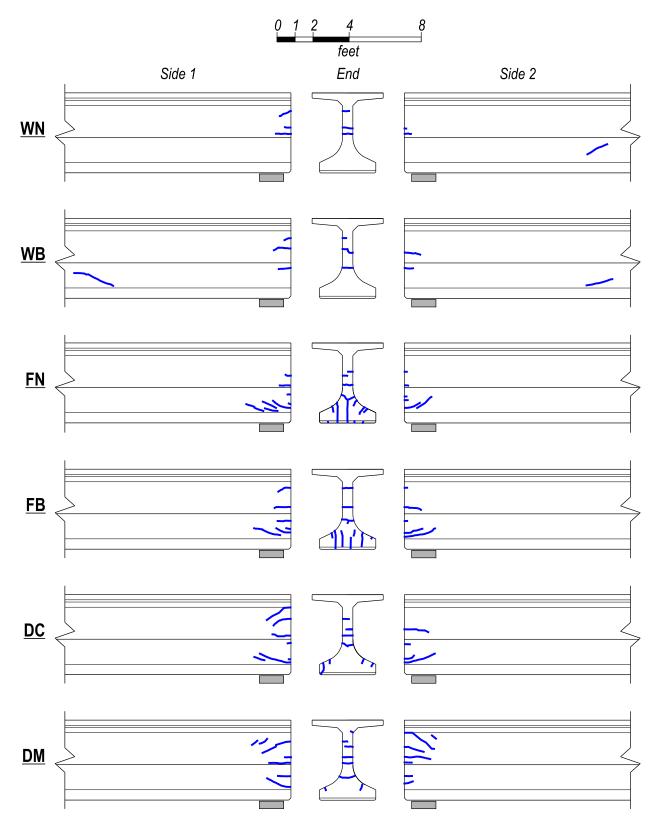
Web and flange splitting cracks. Flexural cracks in the top flange are not shown.
